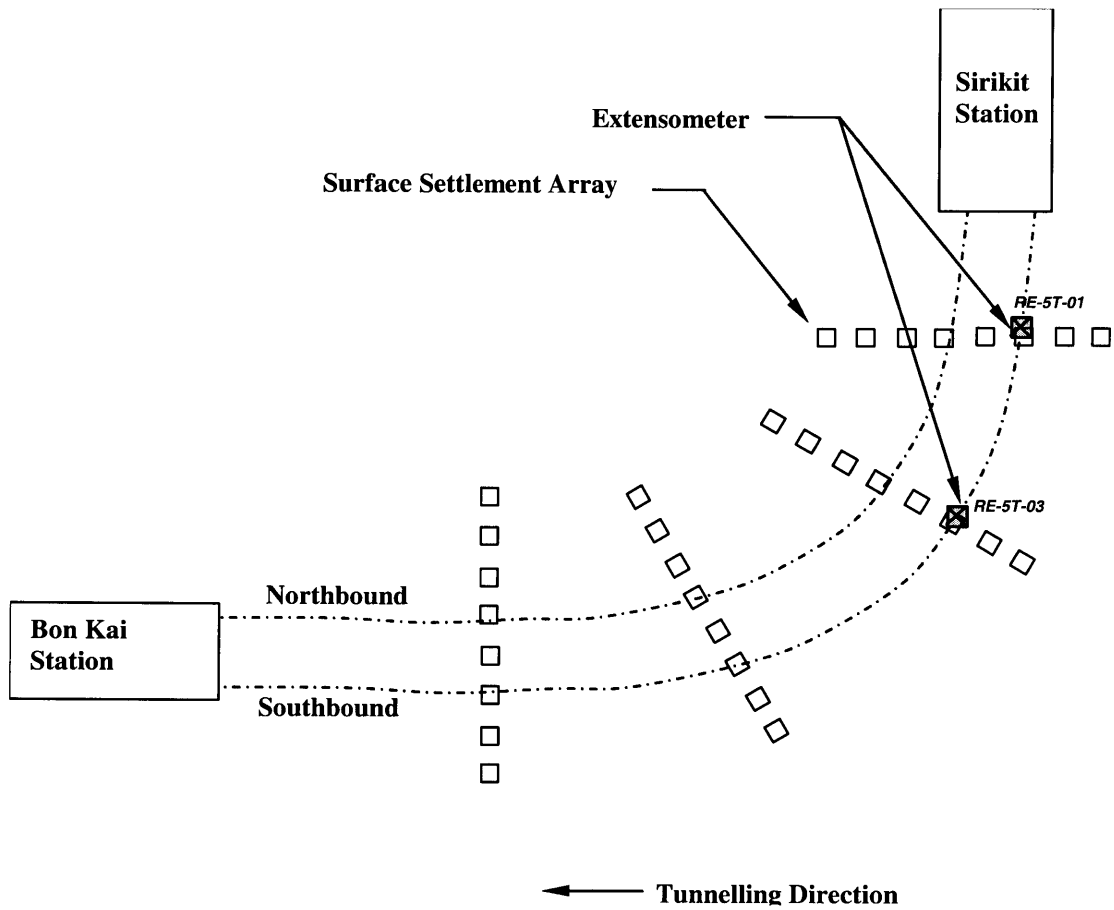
Instrumentation layout of the tunneling section from Sirikit to Bon Kai stations
